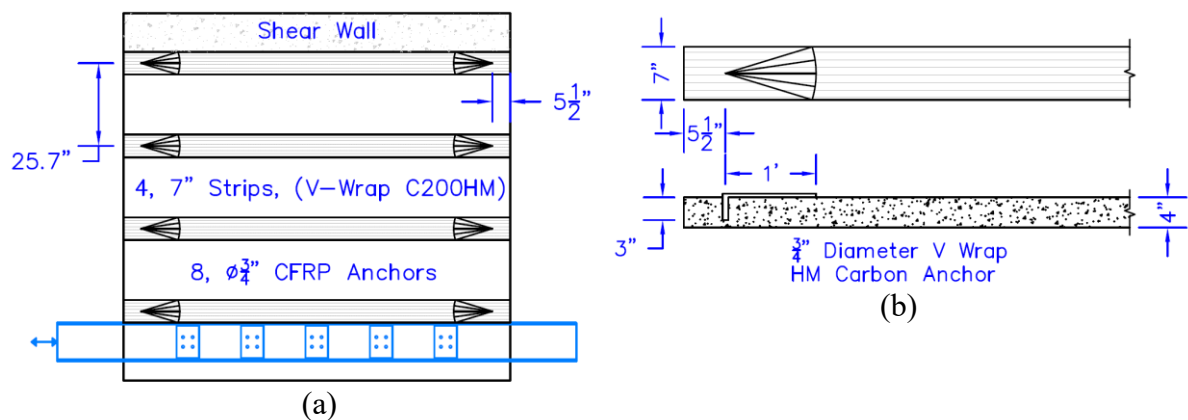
Retrofit of Specimen CD5: (a) Plan View of Retrofit; (b) Anchor Details.
